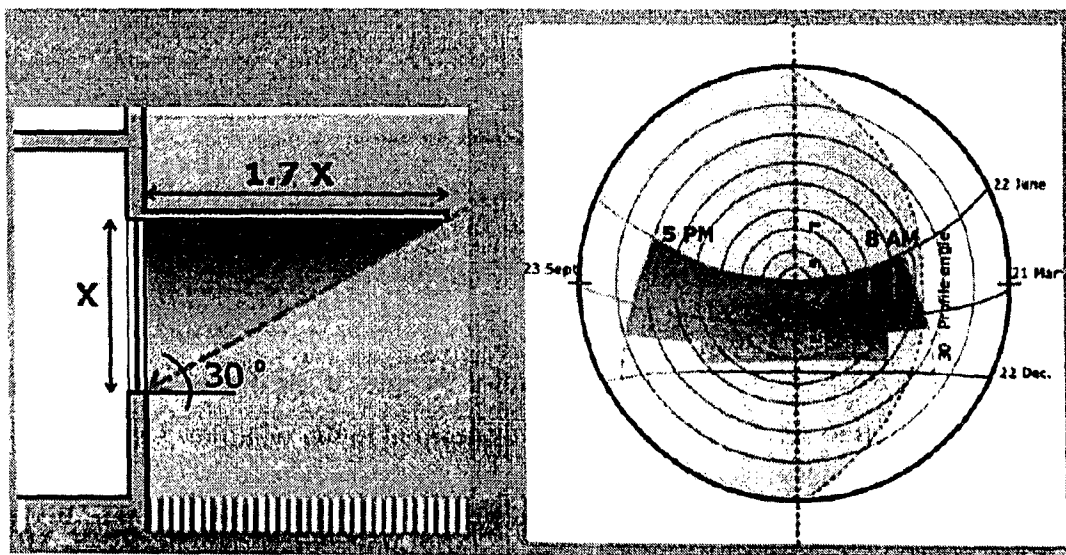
Overhang with 30- degree cut-off angle will shade an east window from 8 AM to 5 PM.
